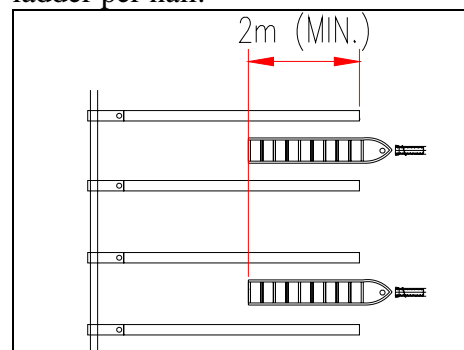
Typical top view of a layer comprising steel strips connected to the facing and ladders connected to the nail heads
